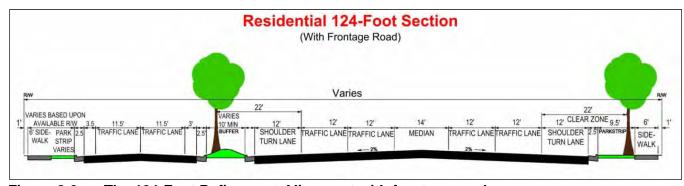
The 124-Foot Refinement Alignment with frontage road.
